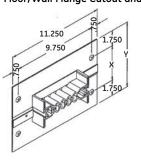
Floor/Wall Flange Cutout and Drilling Detail
